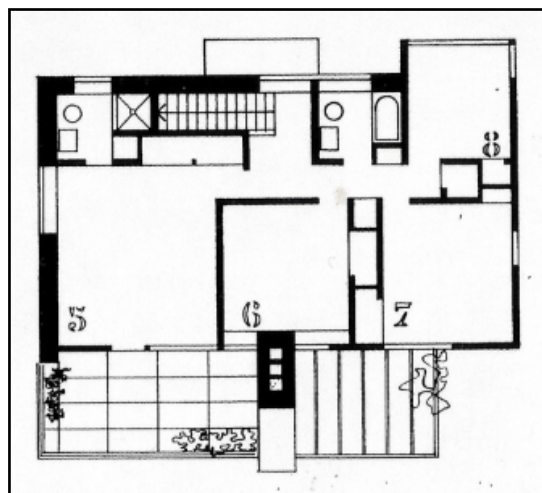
Oser House Second floor plan. (McCarter, 2005, p.33)
